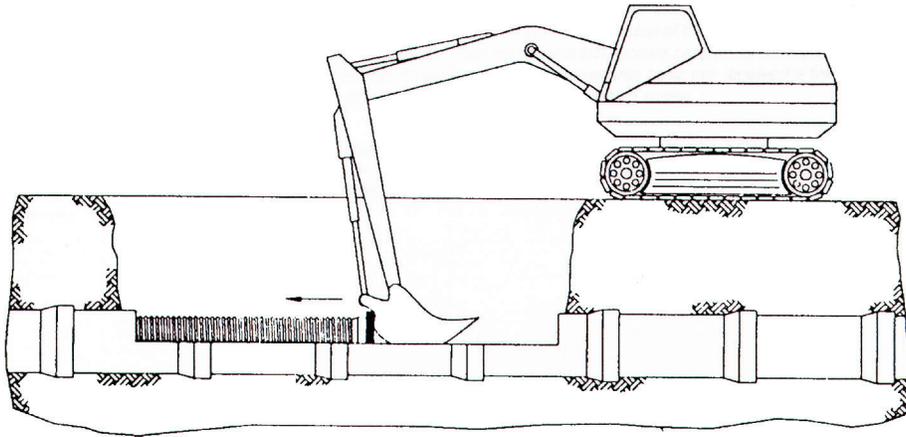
Drawing. Segmental Sliplining Installation Using the Push Method.⁽¹⁵⁾
